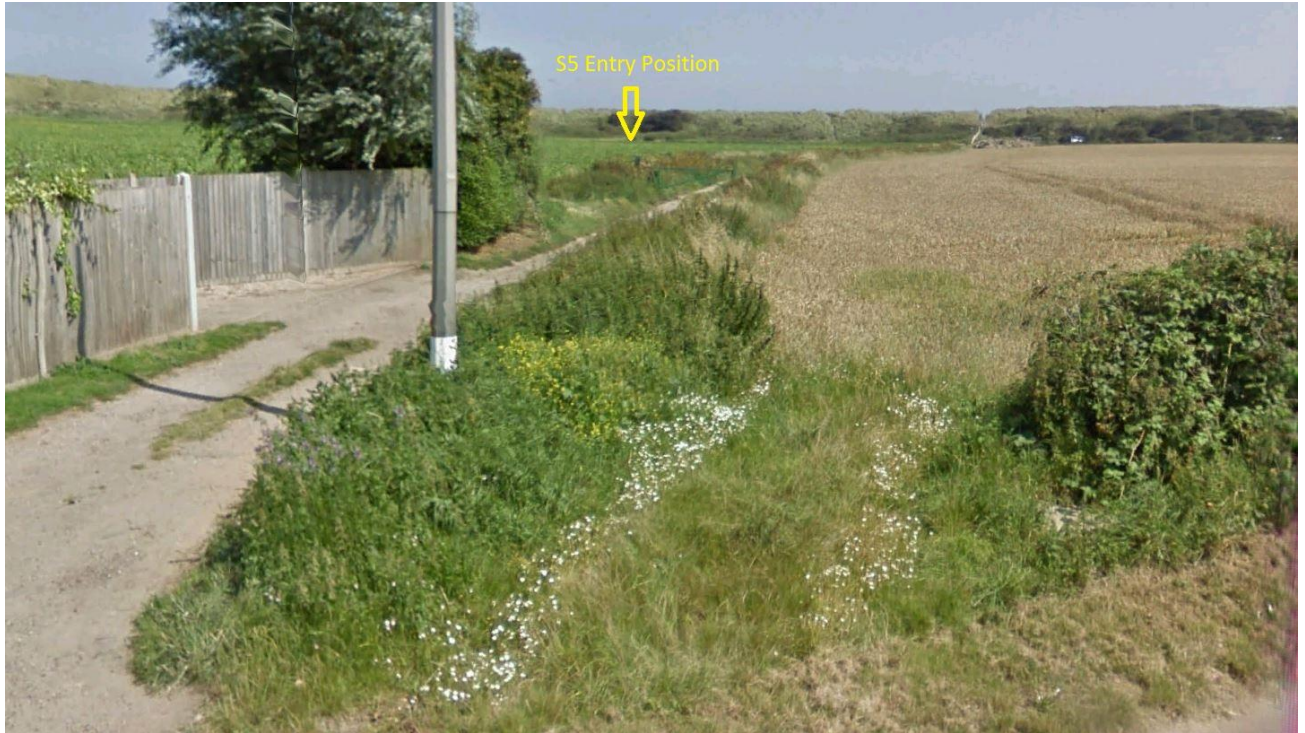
Site 5. Google Street View from Waxham Road looking north-northeast. Potential HDD entry point at end of the field before the dunes. Access track in foreground and junction with Waxham Road might require upgrading for HDD equipment.
